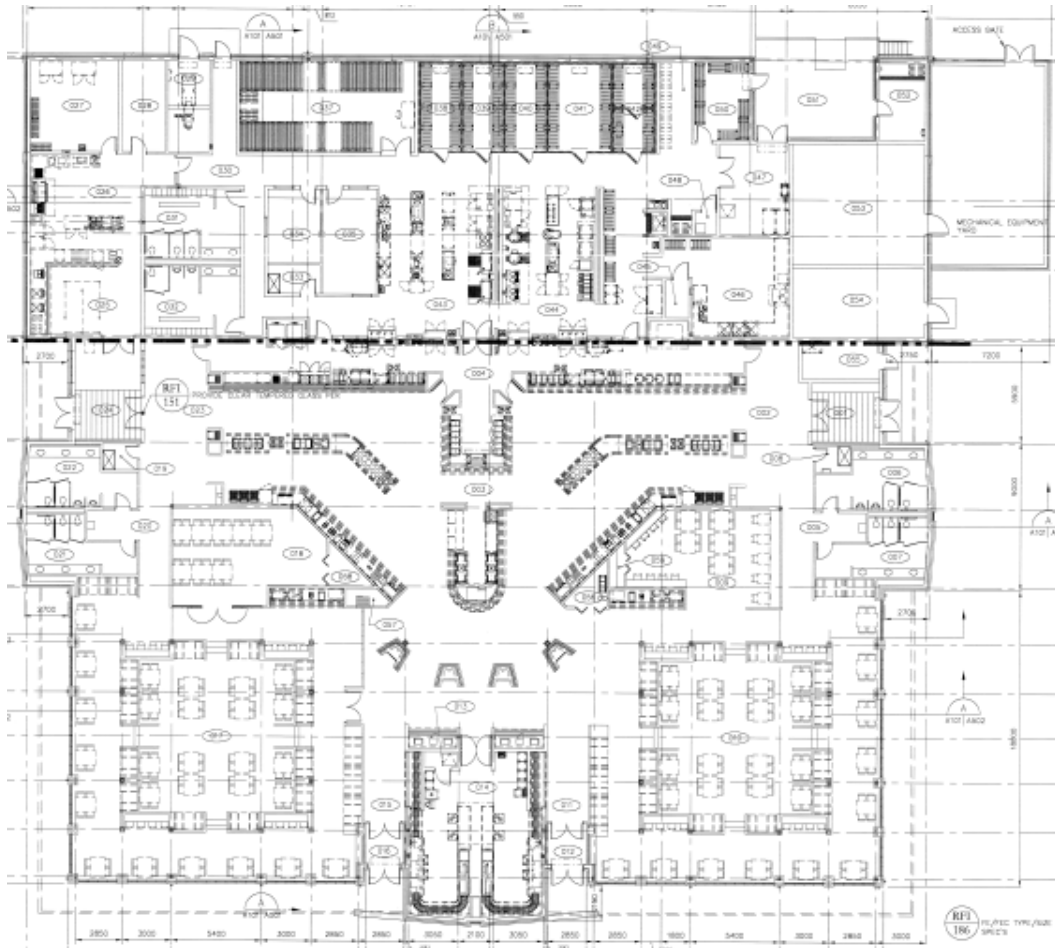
DFAC floor plan. Bldg 1444, Fort Carson, CO.
